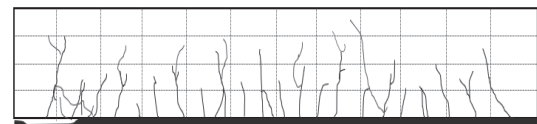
Cracking pattern of specimen strengthened with carbon fiber sheet
